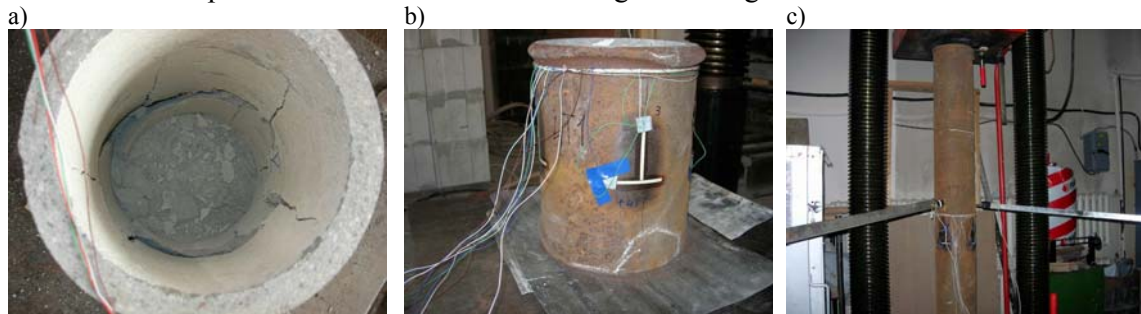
Specimens of Type I test: a) HC-type specimen after testing; b) short HC-FST-type specimen after testing; c) long HC-FST-type specimen during the test.
